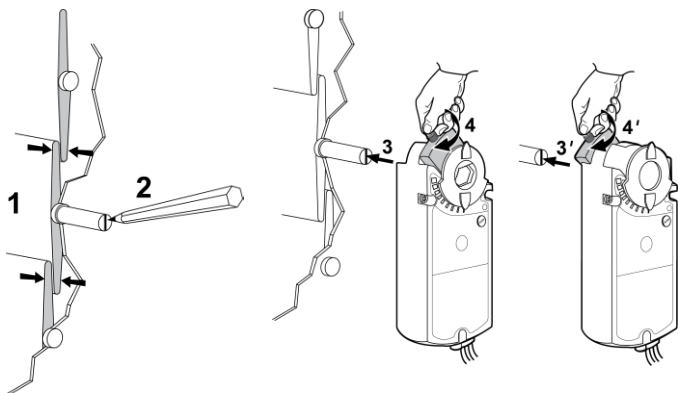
Mount the Actuator to the Shaft. Go to Figure 9 to Complete the Mounting.
